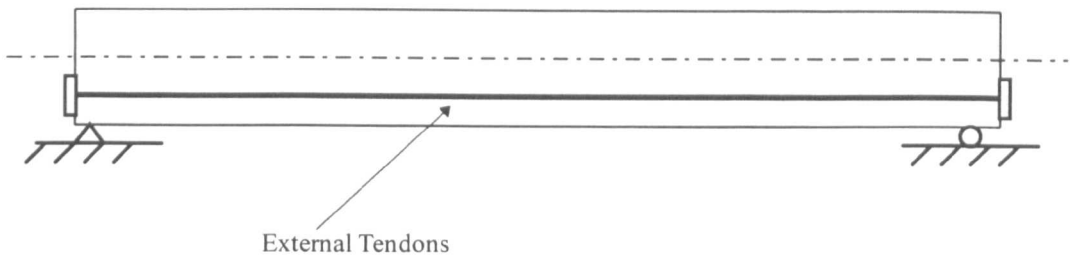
Externally prestressed beam with straight tendons fixed at the anchorages
